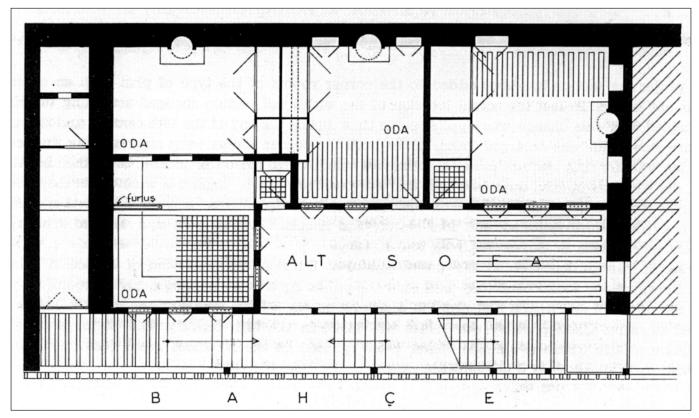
Ground plan of the ground floor of the Genç ağa house in Tekirdağ, 17th century (Eldem 1984, 74)
